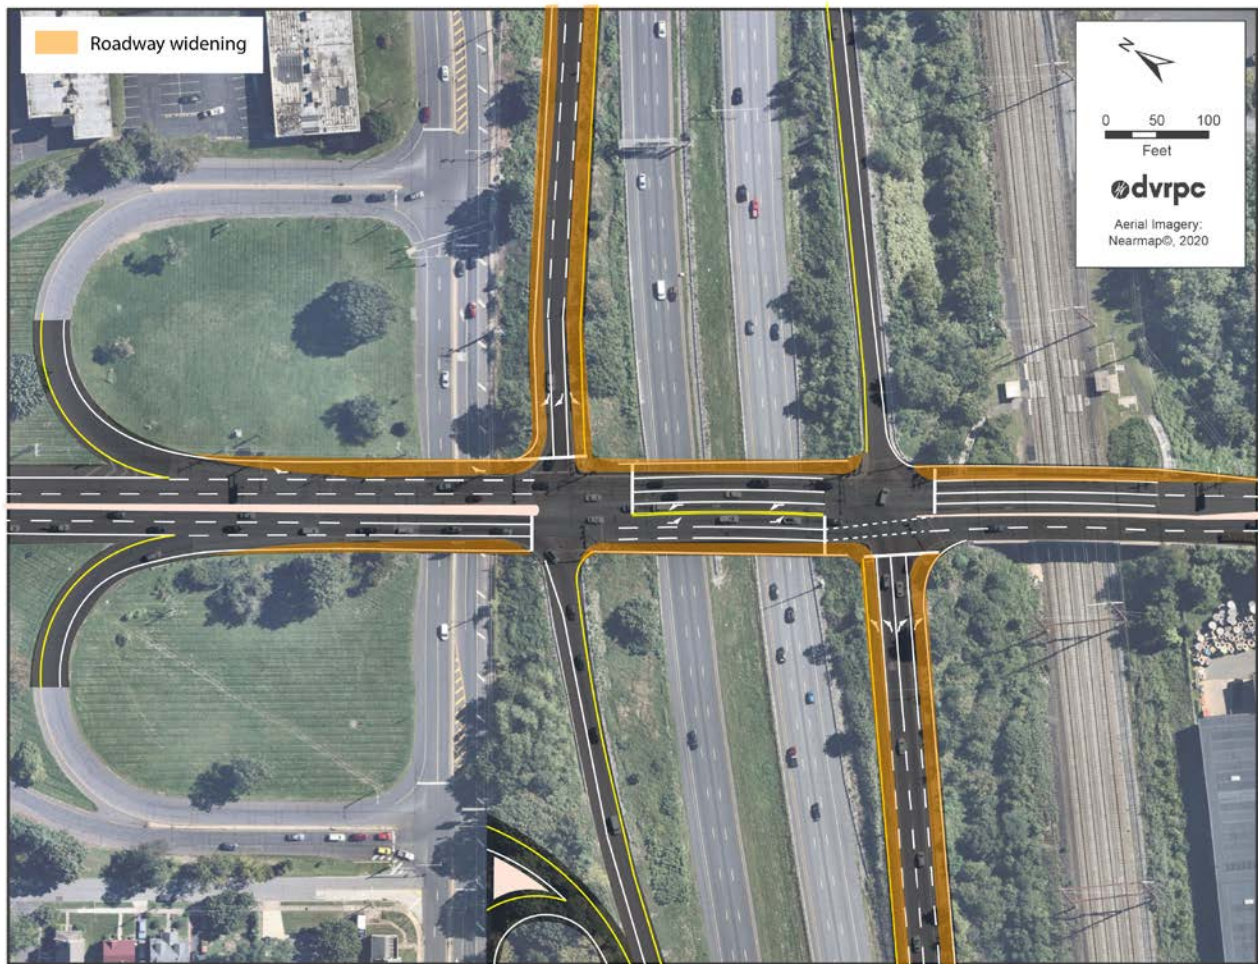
Roadway Configuration, Street Road and I-95 Intersections, Future Year (2045) + Improvements Alternative B
